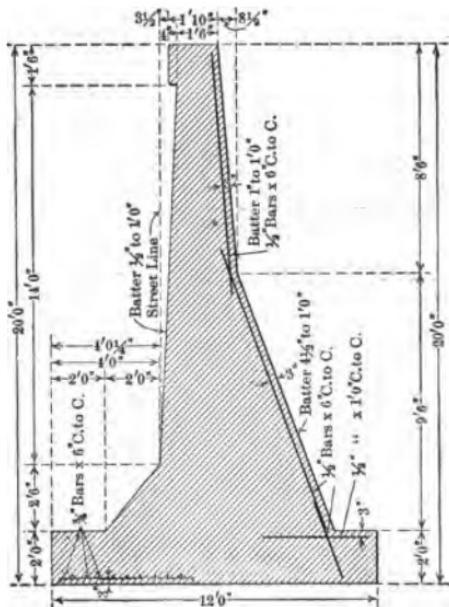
Typical Cross-section of Track Elevation Retaining Wall.
